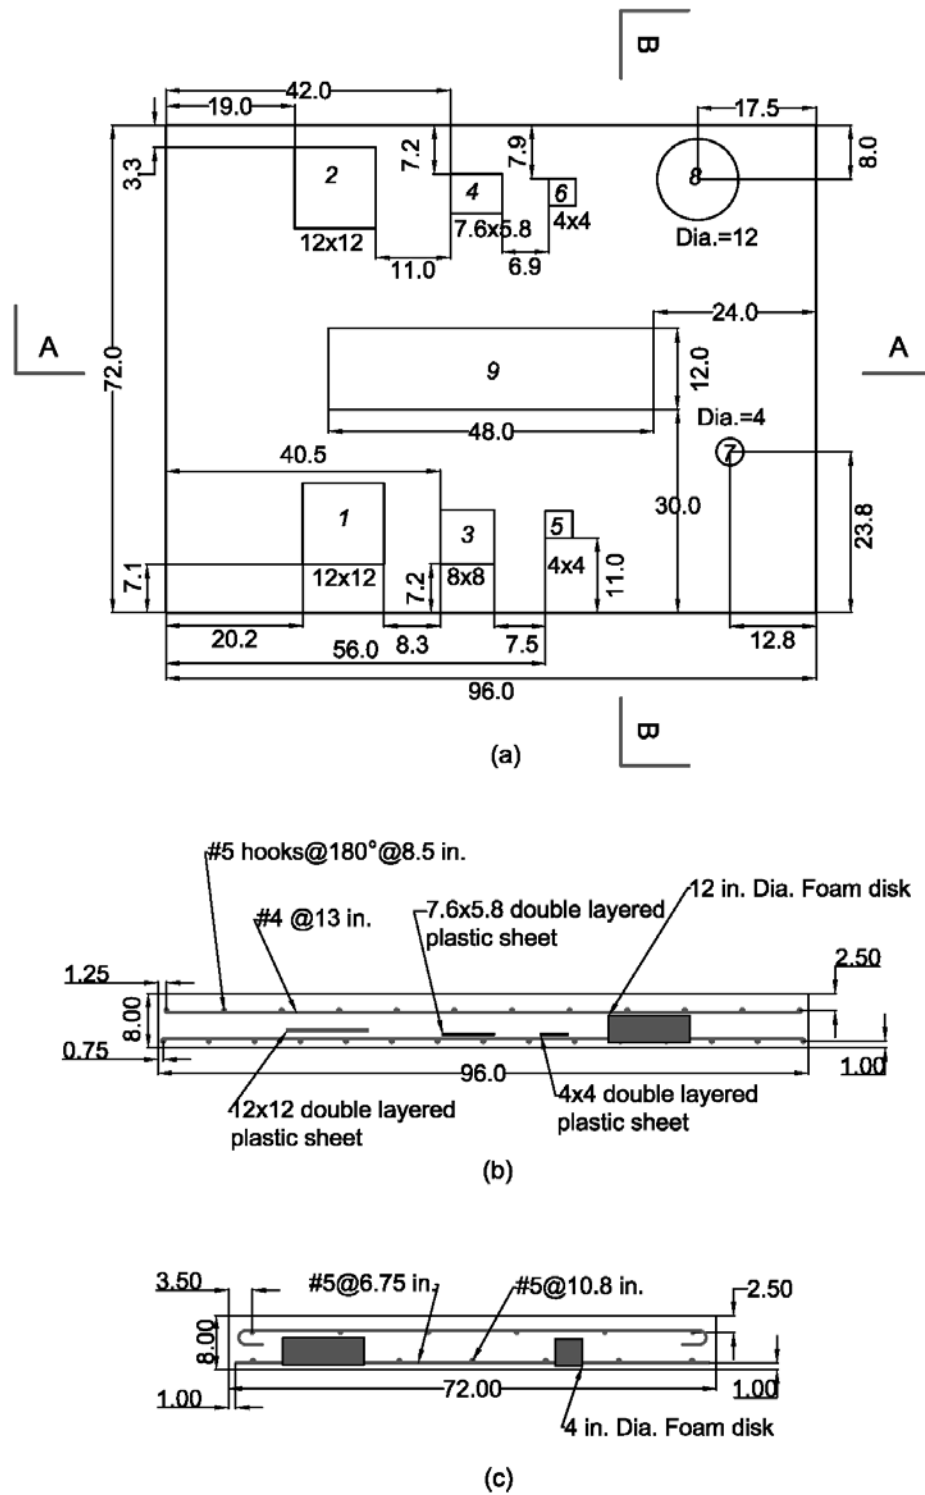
Mock-up reinforced concrete bridge deck with artificial defects: (a) as-built plan view; (b) cross-section A-A; (c) cross-section B-B (all dimensions in inches).
